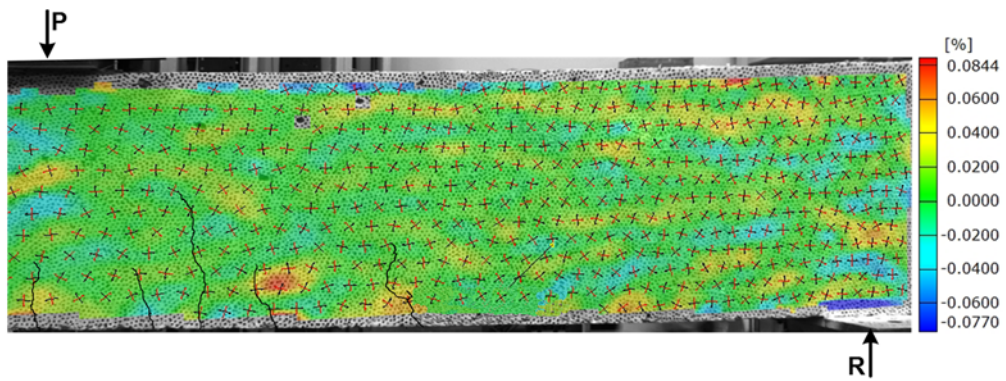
Full-field concrete transvers strain ( $\epsilon_y$ ) across shear span for specimen RC18a at load 35 kips
